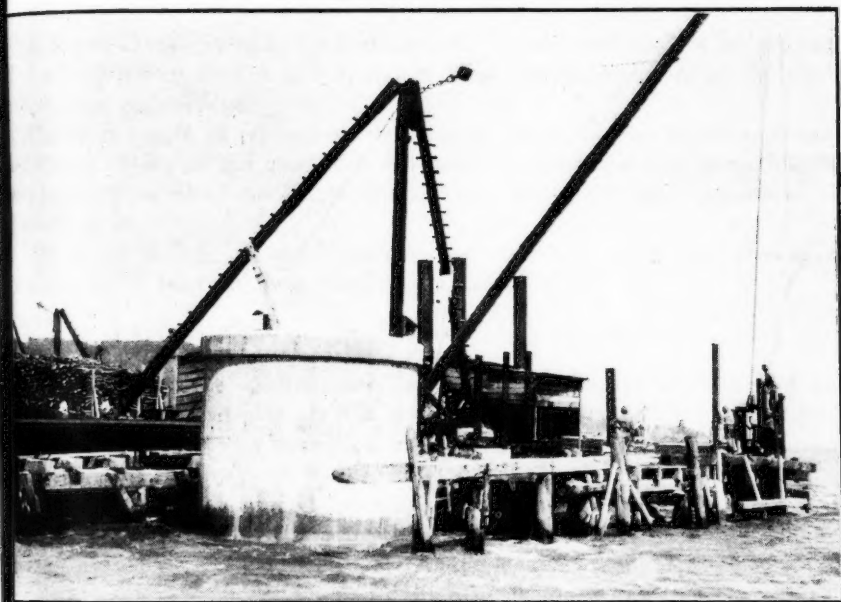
VIEW OF ONE OF THE MAIN PIERS, COMPLETED, FLORIANOPOLIS BRIDGE.
